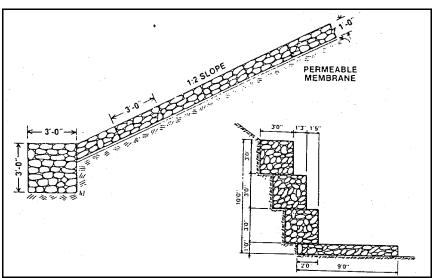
Construction of a gabion retaining wall and mattress (Source: North Carolina Erosion Control Manual)
